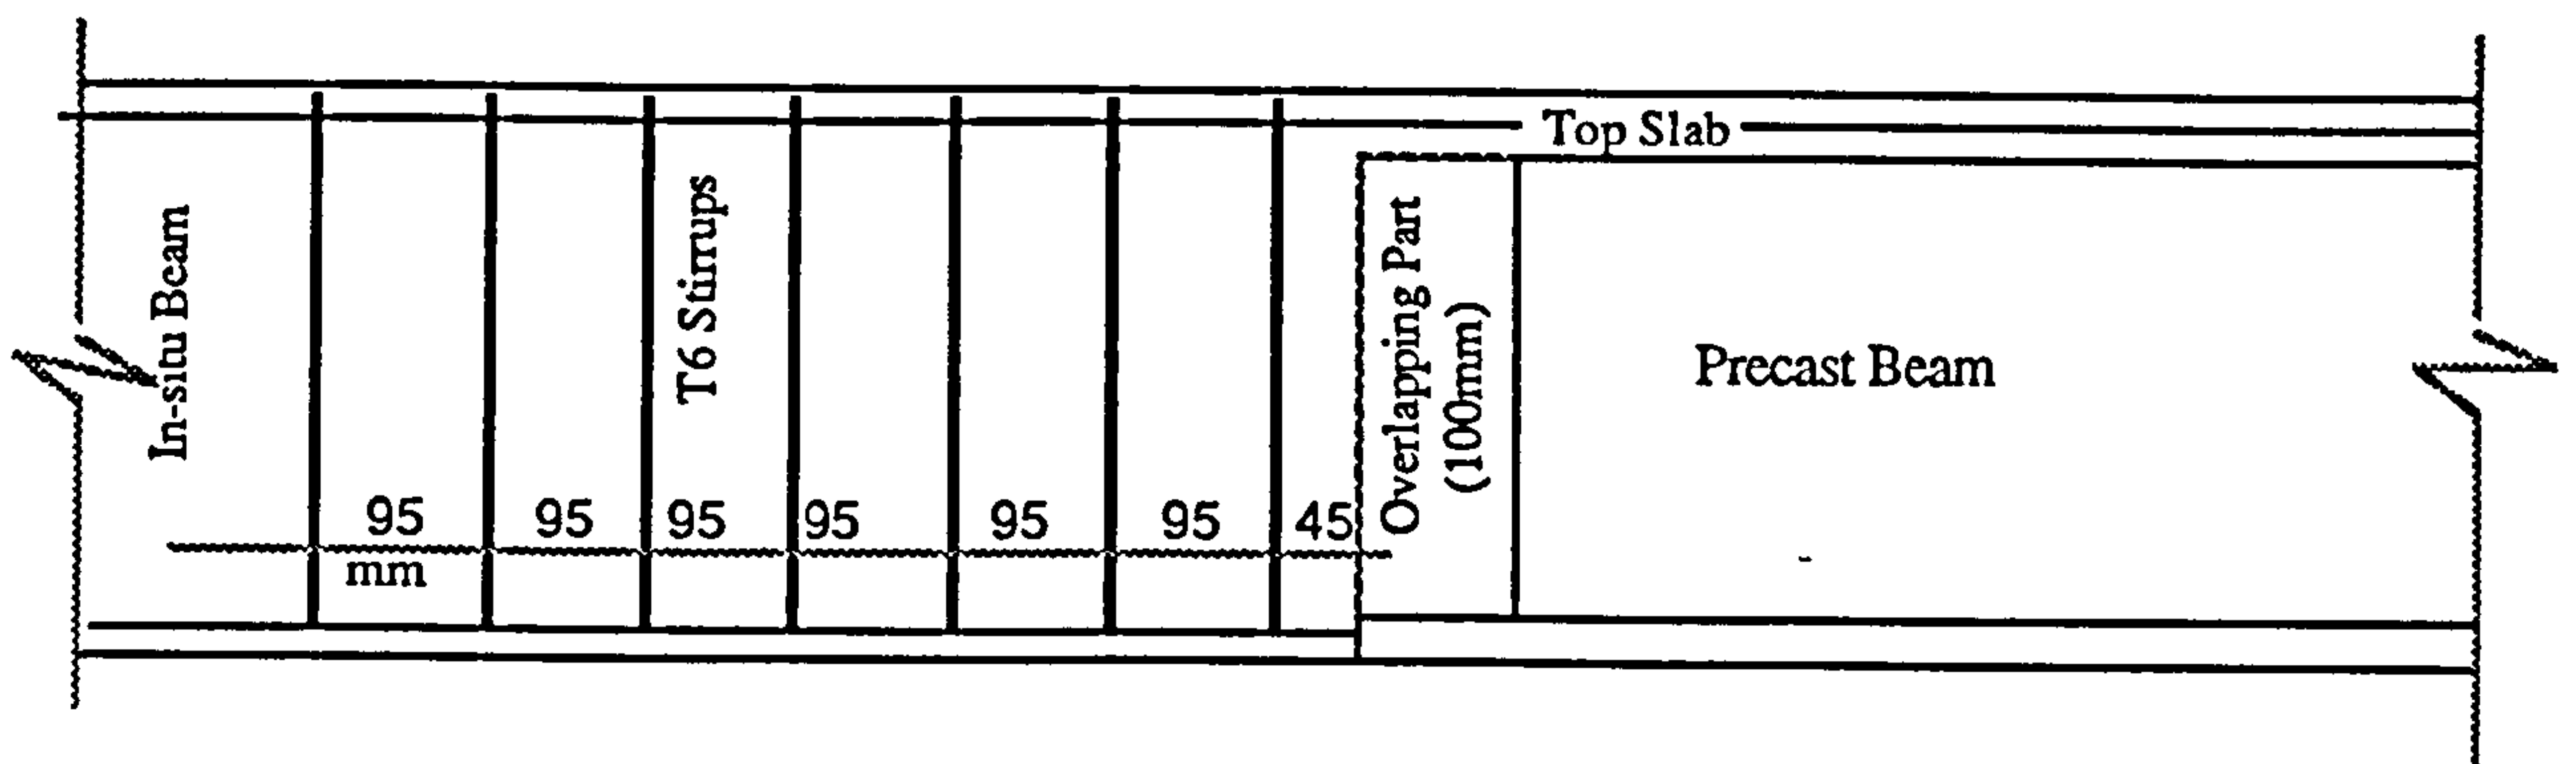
Stirrup Spacings in the In-situ Beam , Tests E10CC5 (Without Stirrups in the Nibs)
